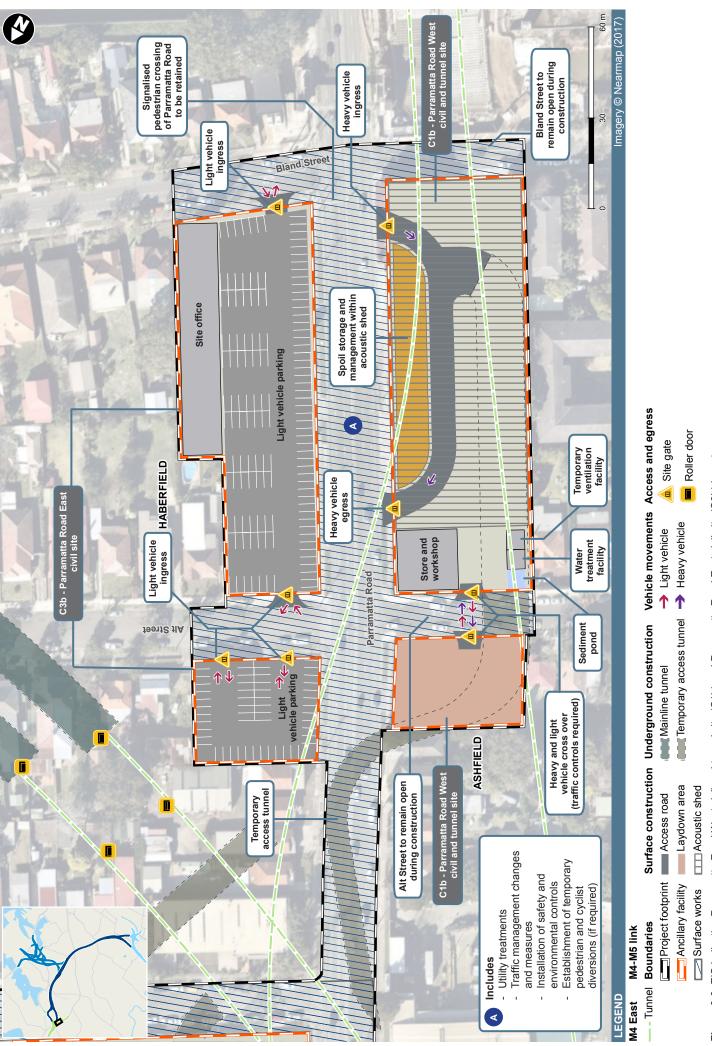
EIS Indicative Parramatta Road West civil and tunnel site (C1b) and Parramatta Road East civil site (C3b) layout
